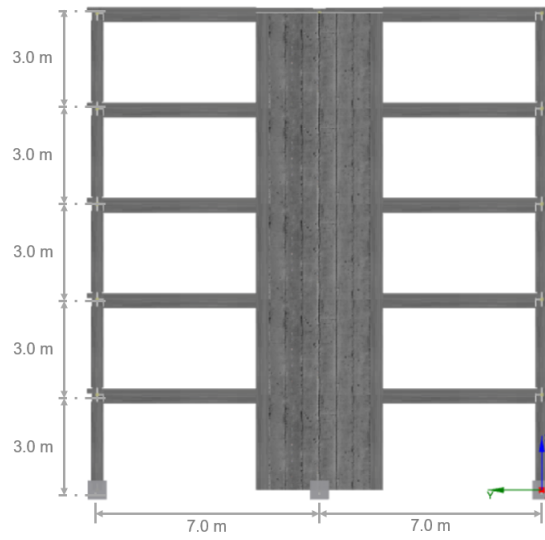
Lateral elevation (Y-Z) of the building.
